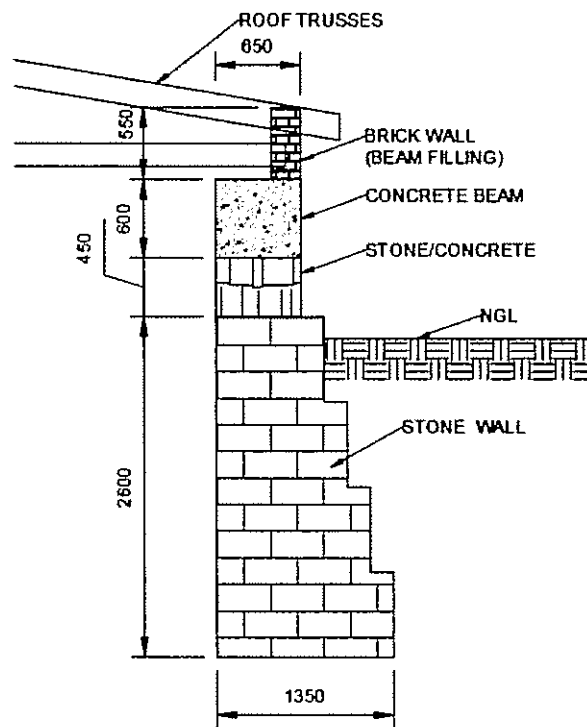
Sketch depicting outer retaining wall of Desalination Building
